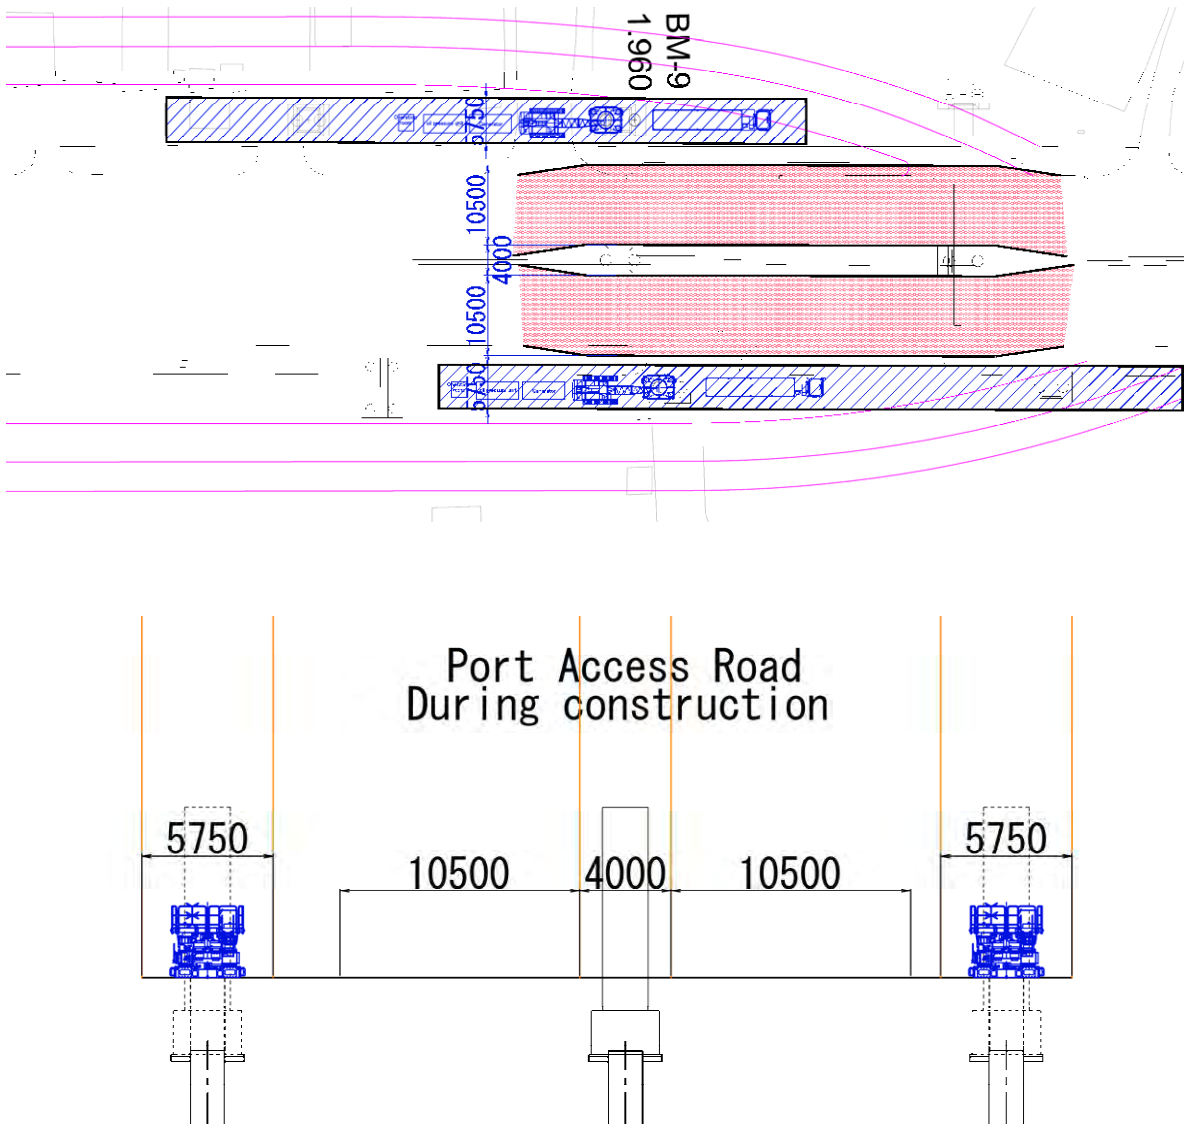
Median Foundation in Port Access Road RC2-P7, Screwed Steel Pile
